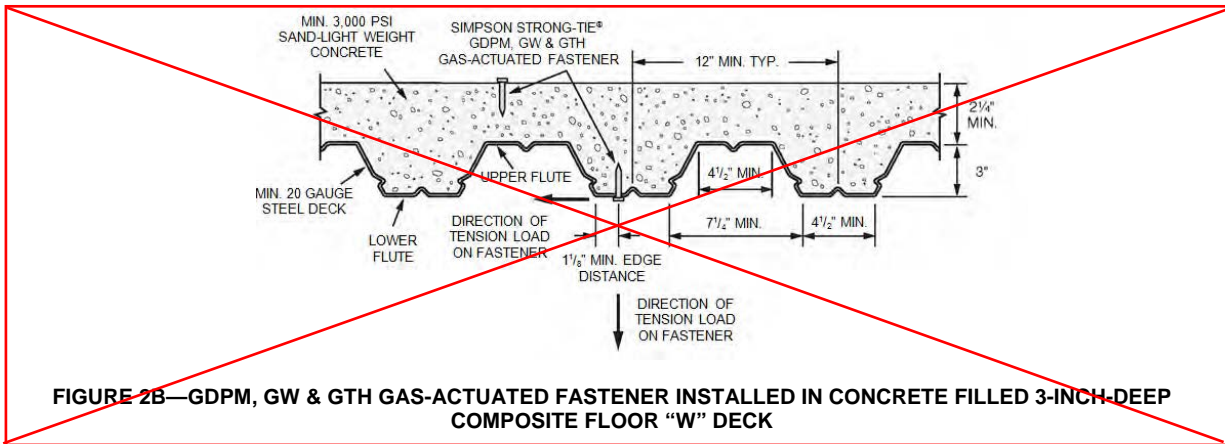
B—GDPM, GW & GTH GAS-ACTUATED FASTENER INSTALLED IN CONCRETE FILLED 3-INCH-DEEP COMPOSITE FLOOR “W” DECK
